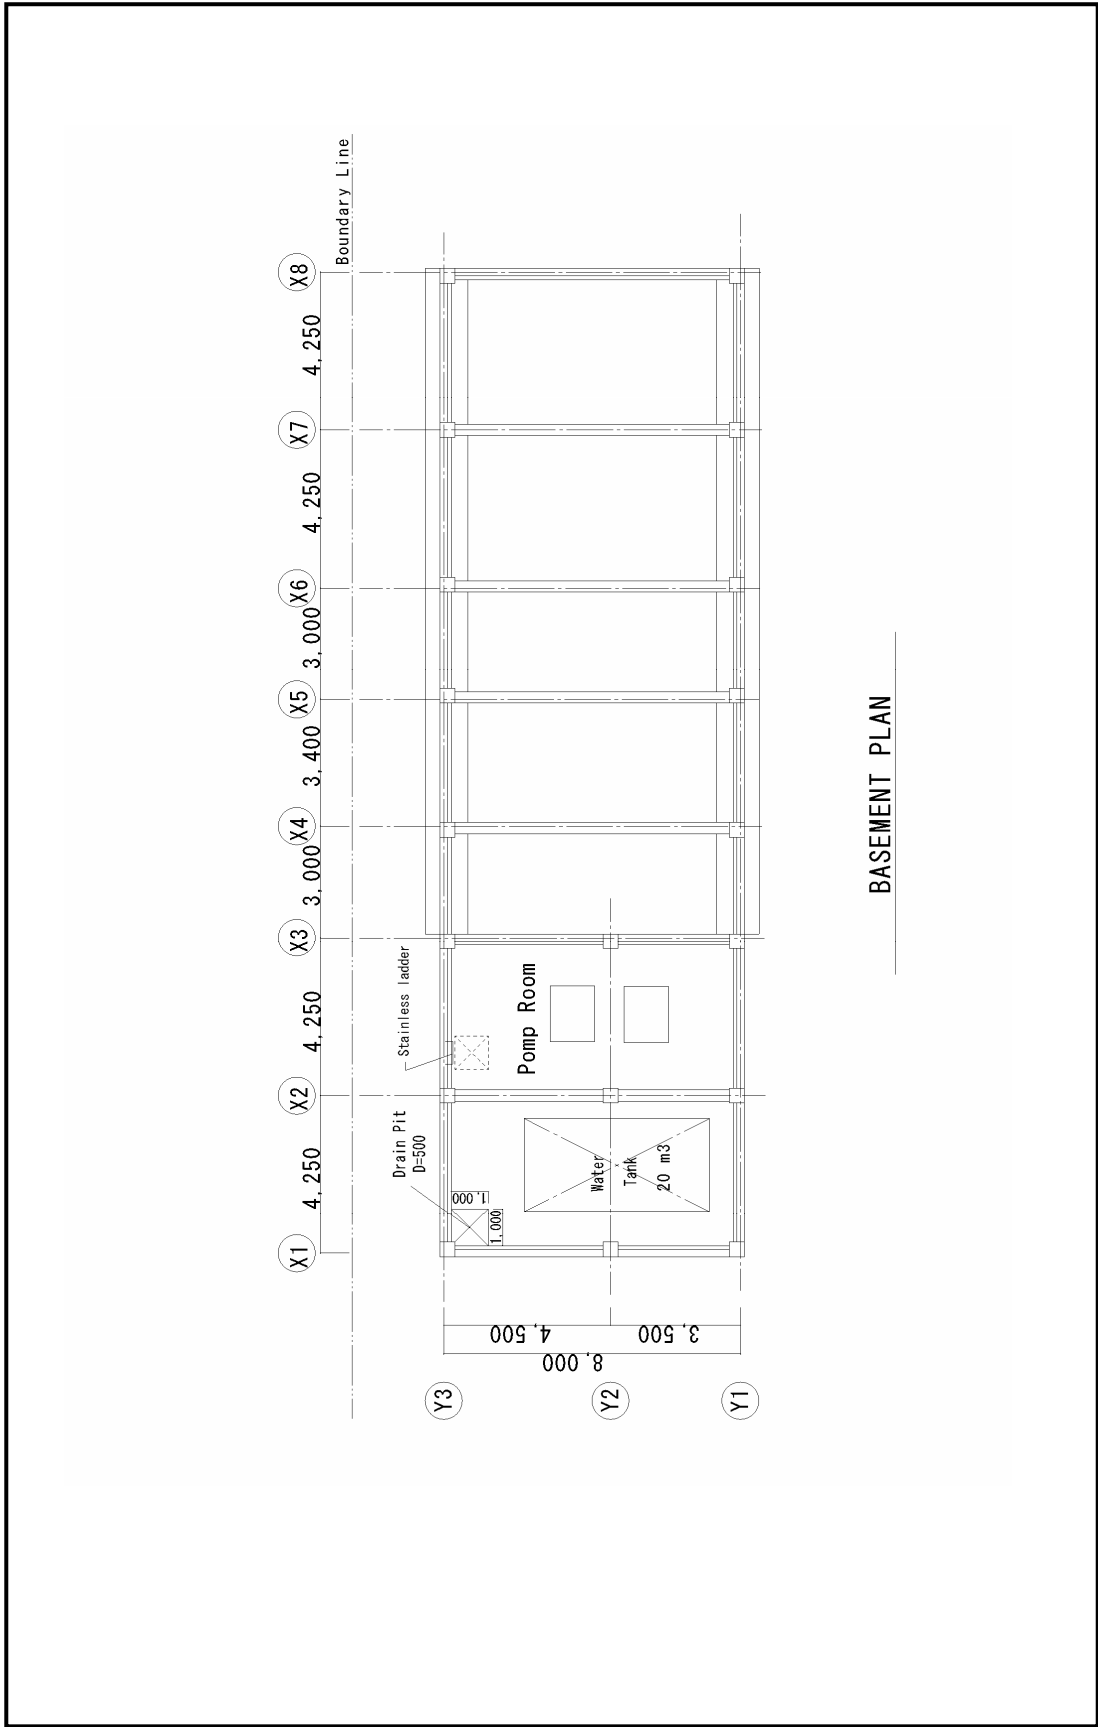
(7) Floor Plan of Fishery Complex (Basement Floor)
